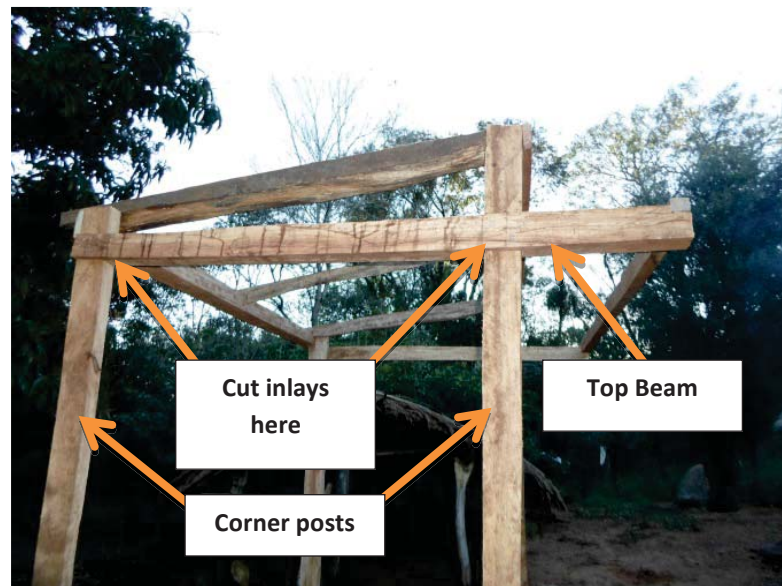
Side wall of latrine showing placement of corner posts and top beam. Photo by author.
